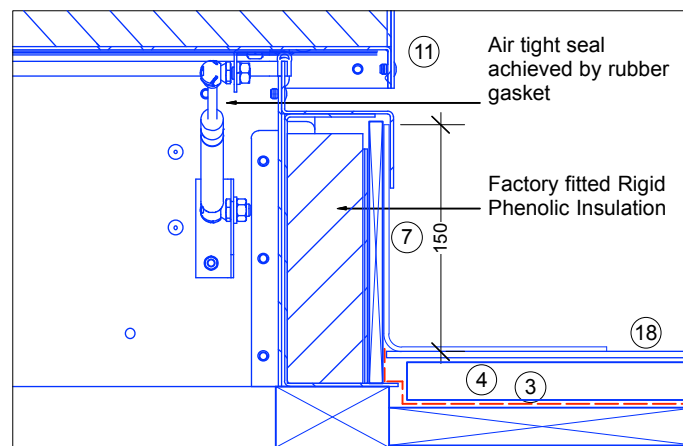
, PARAPET WALL LEAD DETAILS scale 1:5
